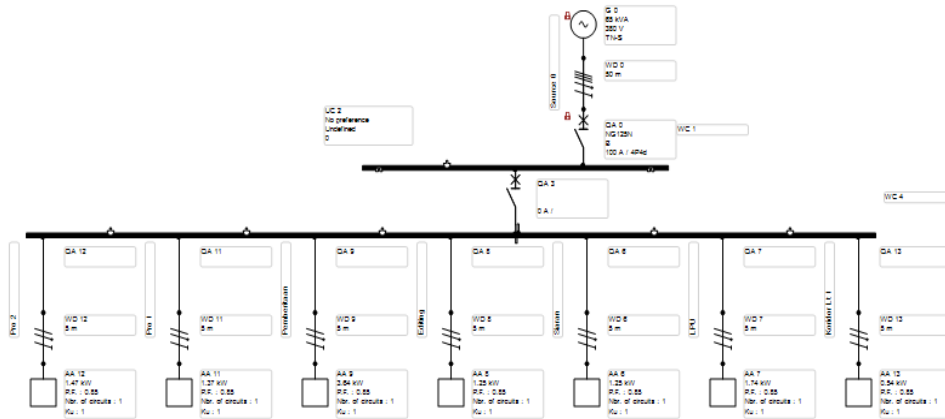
Single-line diagram of the 1st floor of the Main Building on RRI Tarakan
